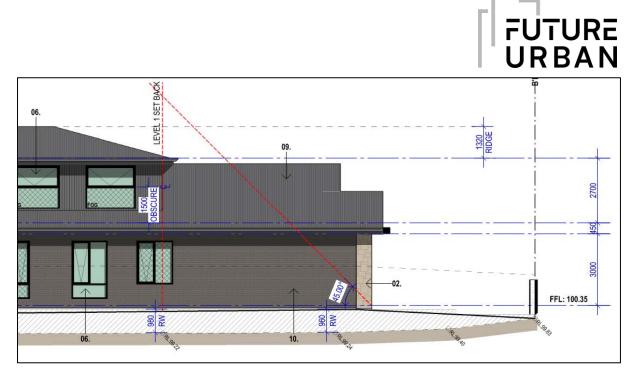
Figure 3 Extract of drawing A2202 of the application plans
